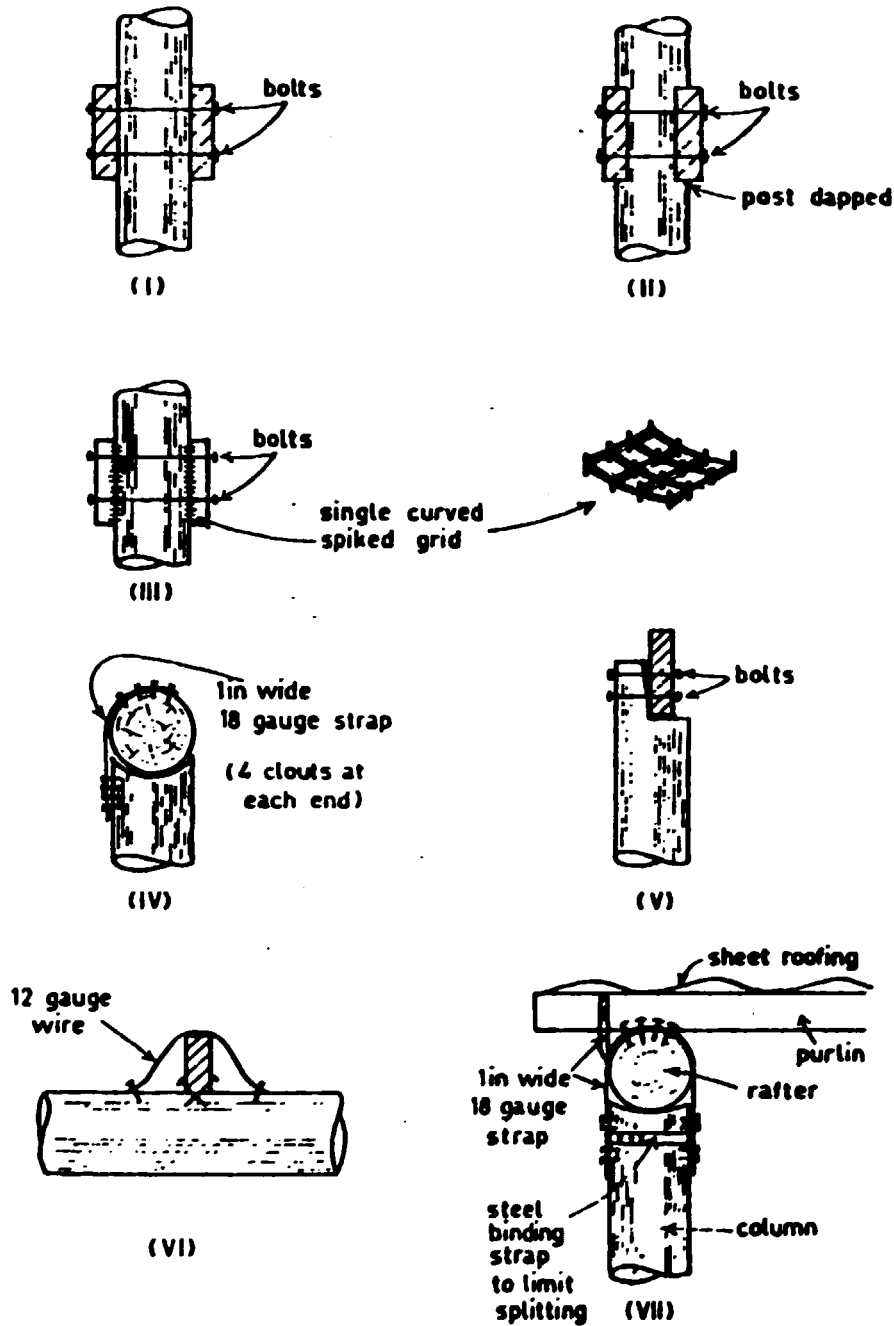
DETAIL OF TYPICAL POLE CONNECTION
